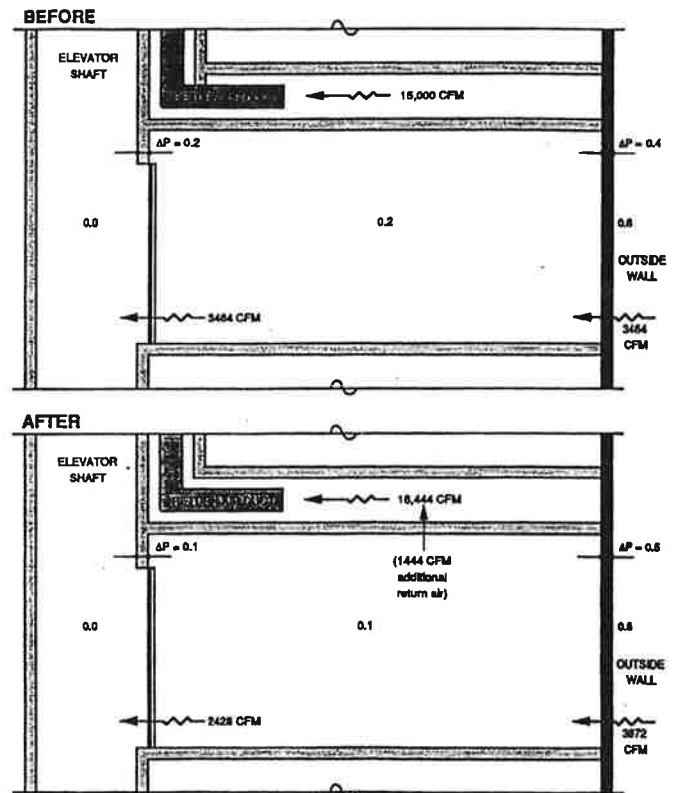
Return air compensation to limit ΔP on elevator doors on second floor of building
